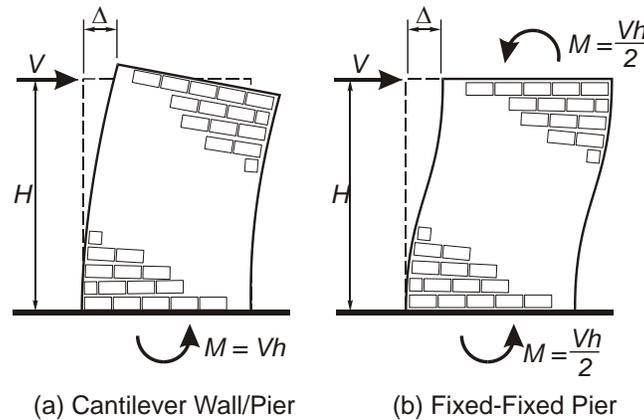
Shear Wall Deformation (DORMS 2012, Figure 3.8.9)
